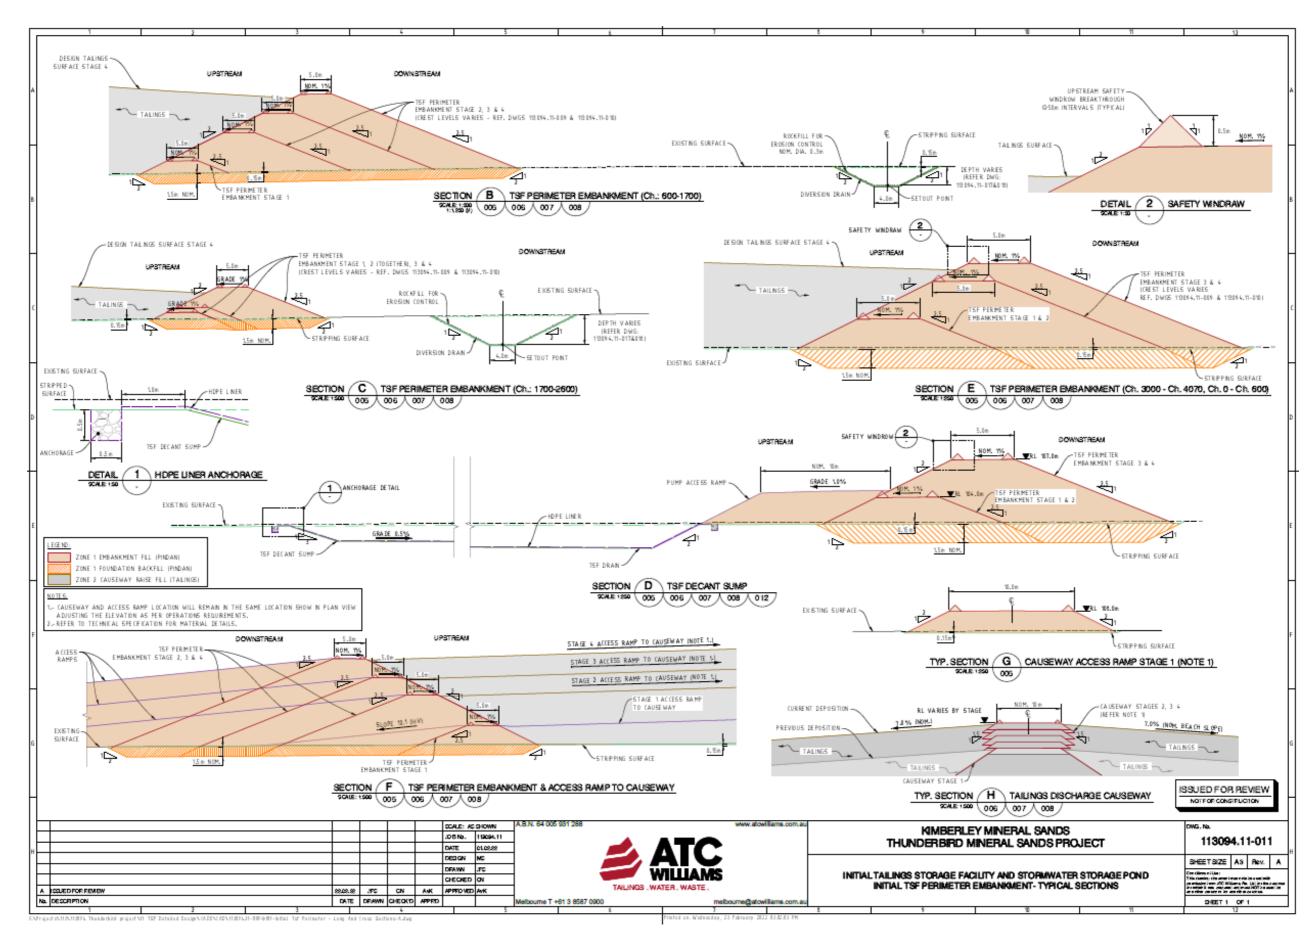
Drawing – Initial TSF and SPP, TSF perimeter embankment, typical sections
